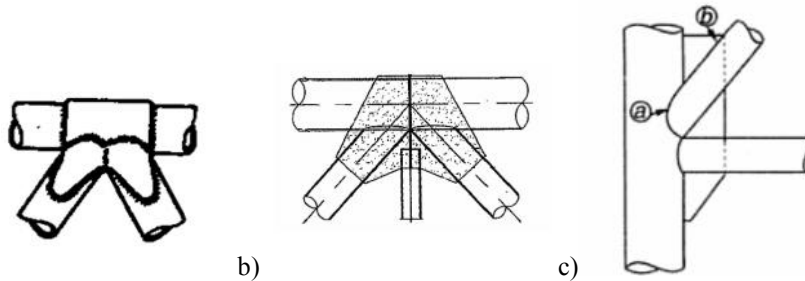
“K” Joints gussets: a) With collar[I01]; b) Inserted [N03]; c) Weld (a) secured by weld (b) [D03]
